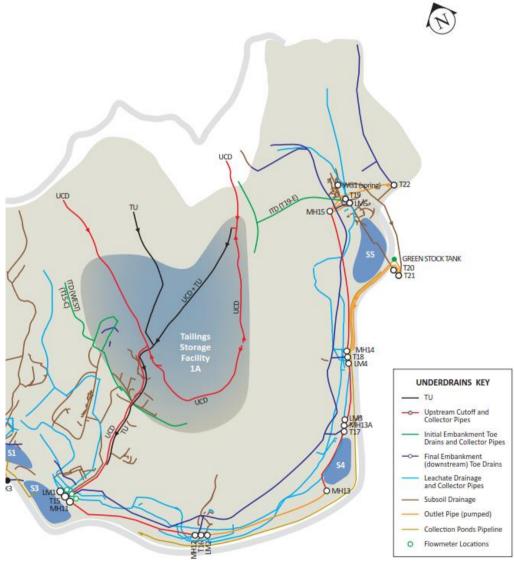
STORAGE 1A UNDER DRAINAGE NETWORK
